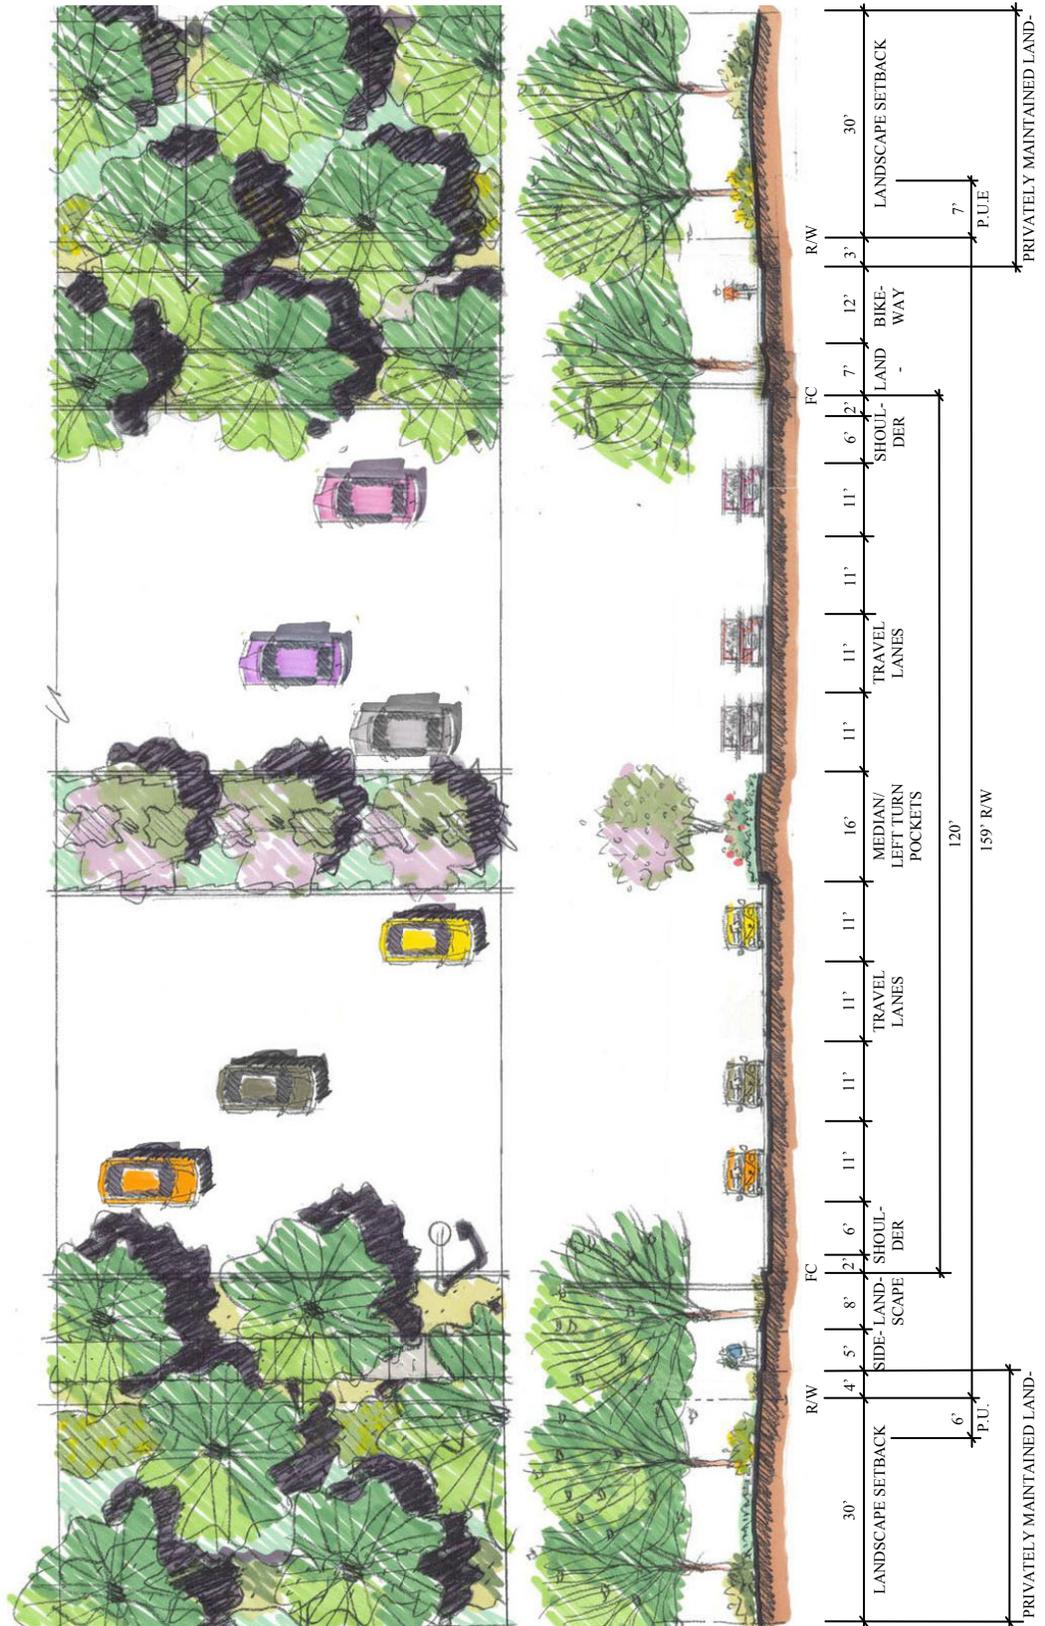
, Conceptual 8-Lane Parkway, Section K-K
